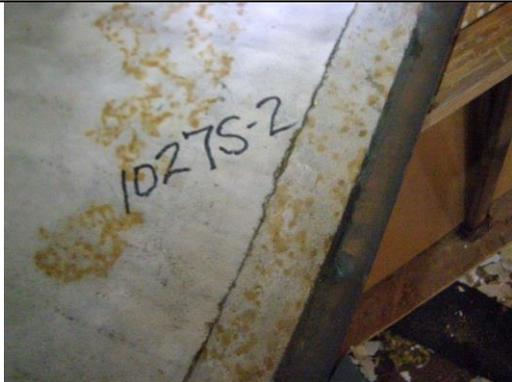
Grate Cover with Wrap (1027S-2) Basement Entry. 65% Chrysotile Asbestos Detected.
